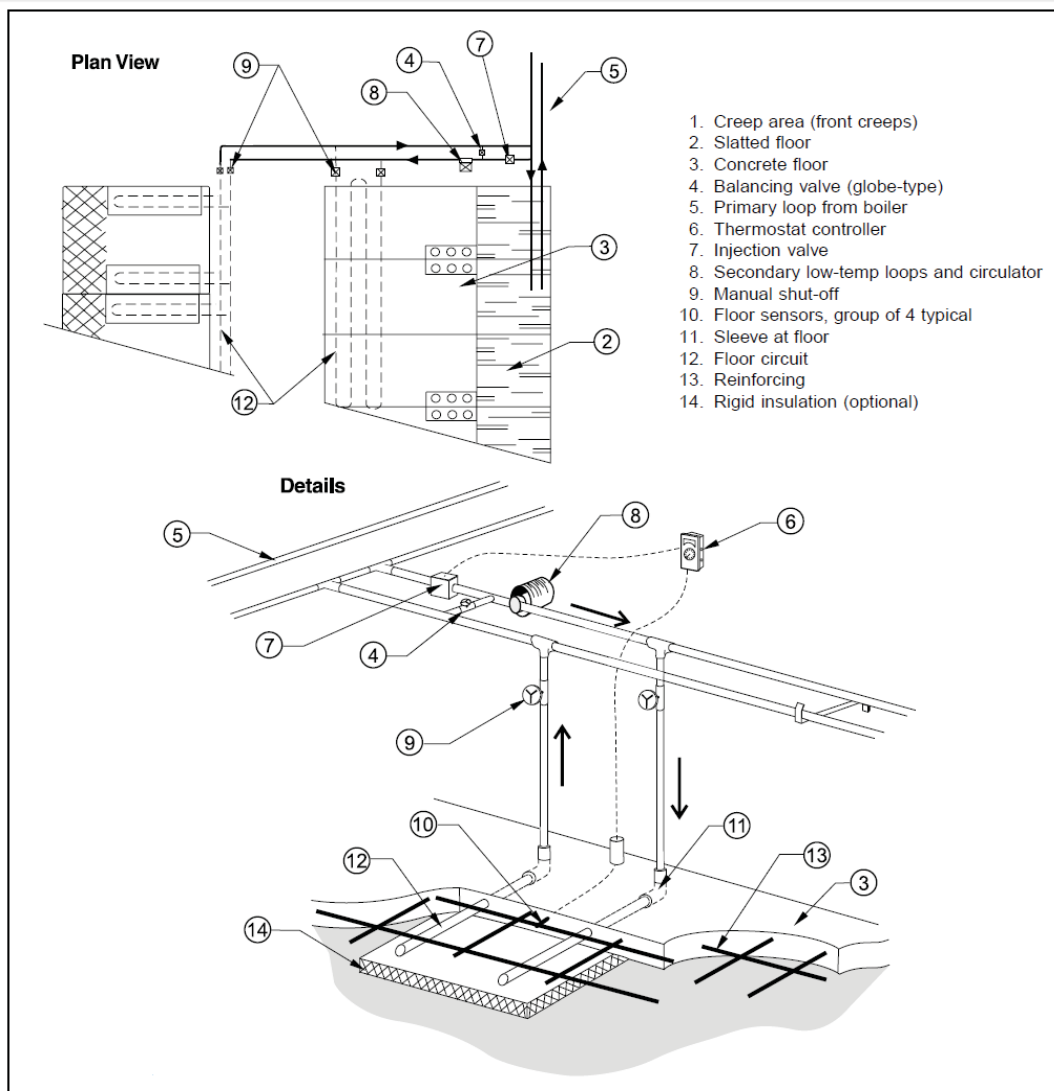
Piggy under-floor heating installation (Darby and Borg, 2004).
